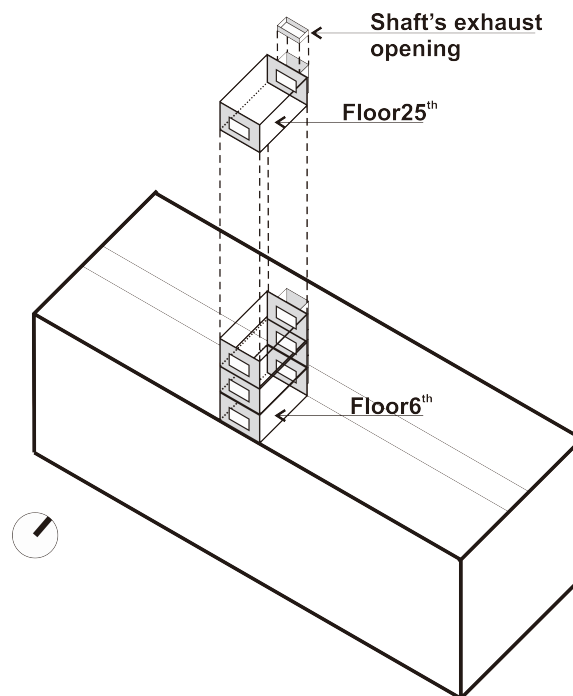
Ventilation shaft implemented to the test rooms between floor 6th and floor 25th.
